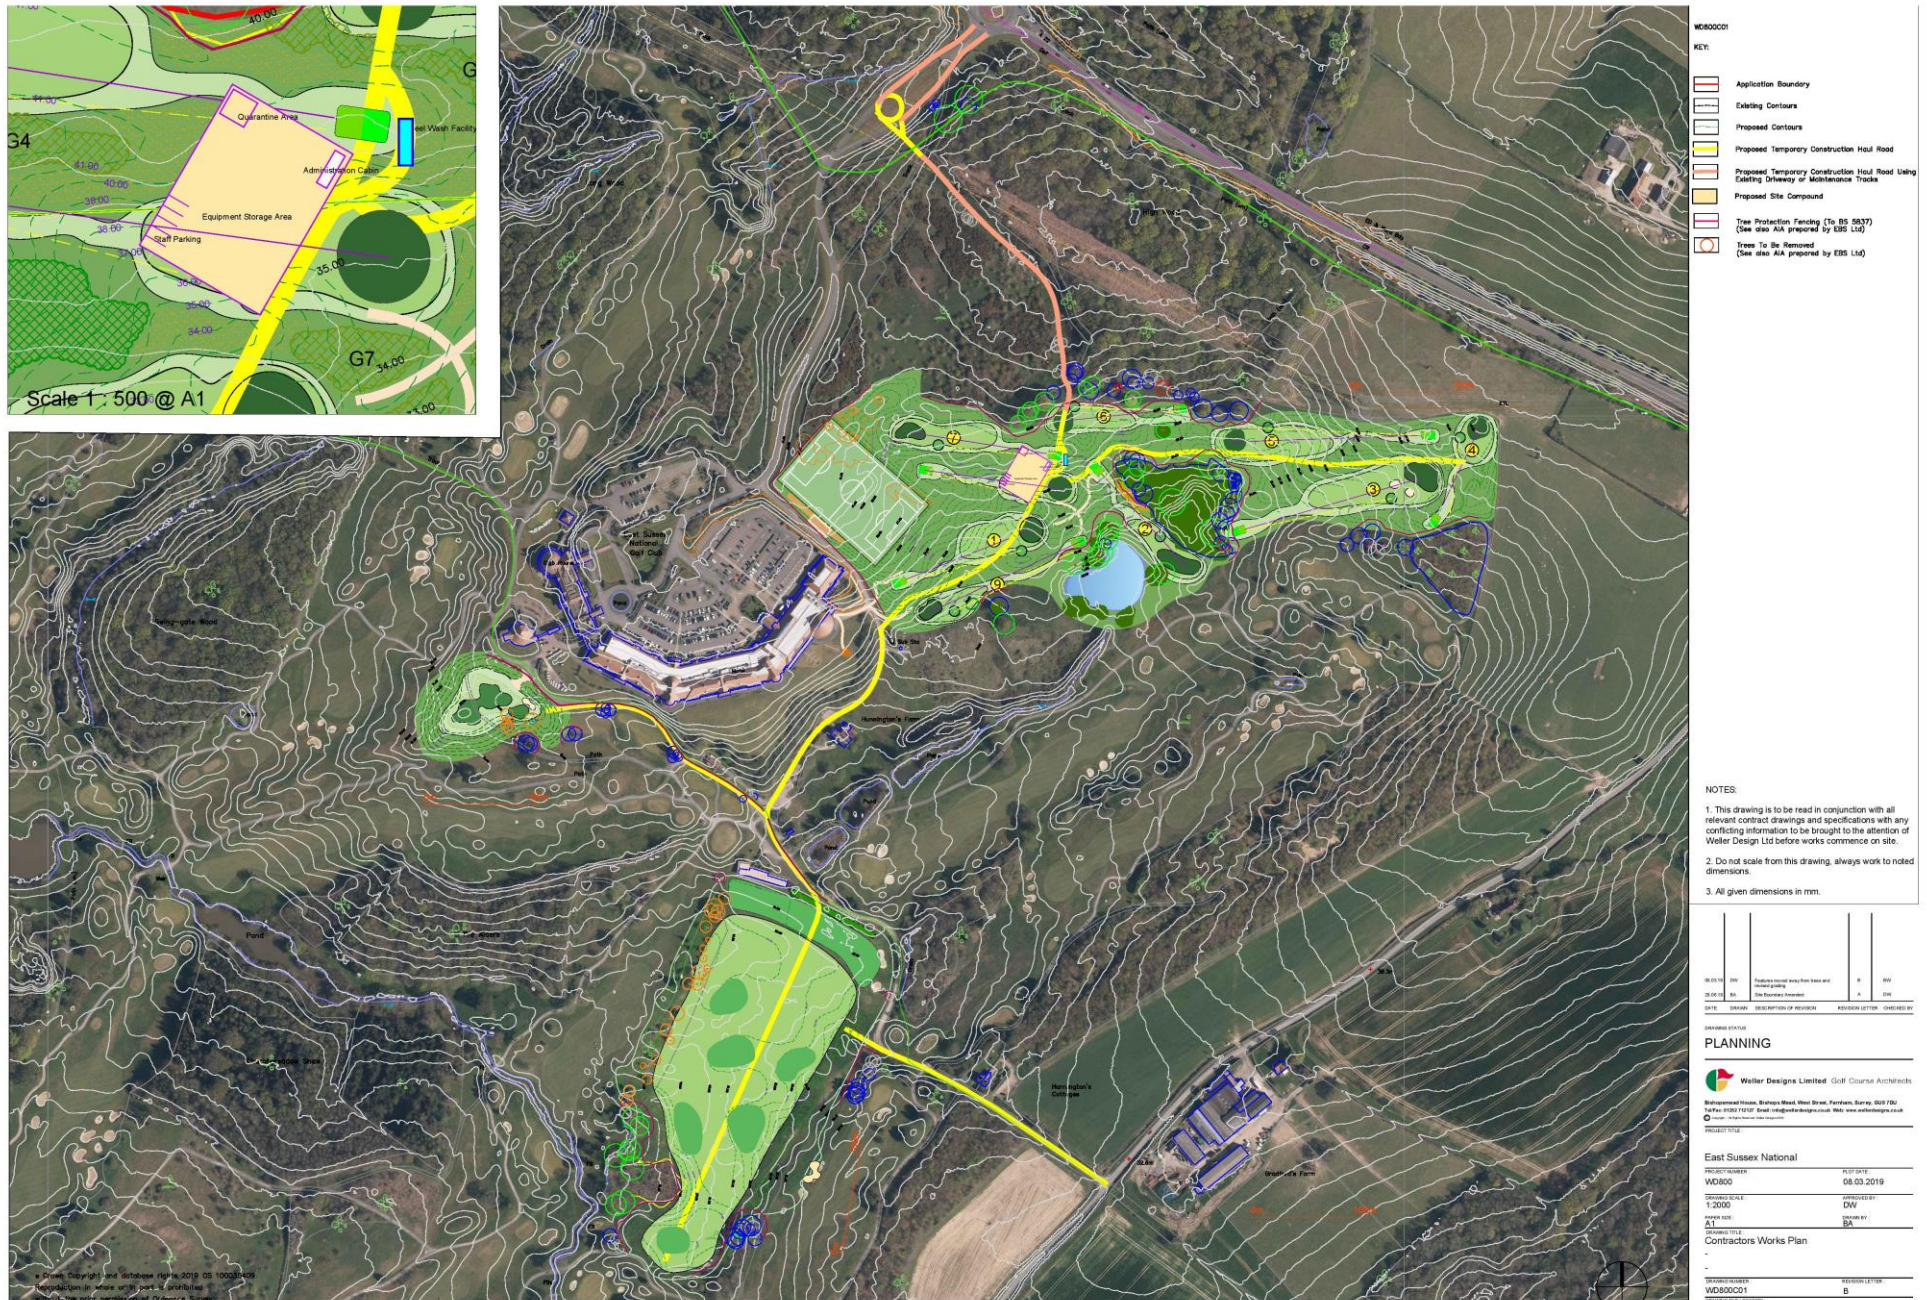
Contractors Works Plan (see also scaled plan WD800C01)
